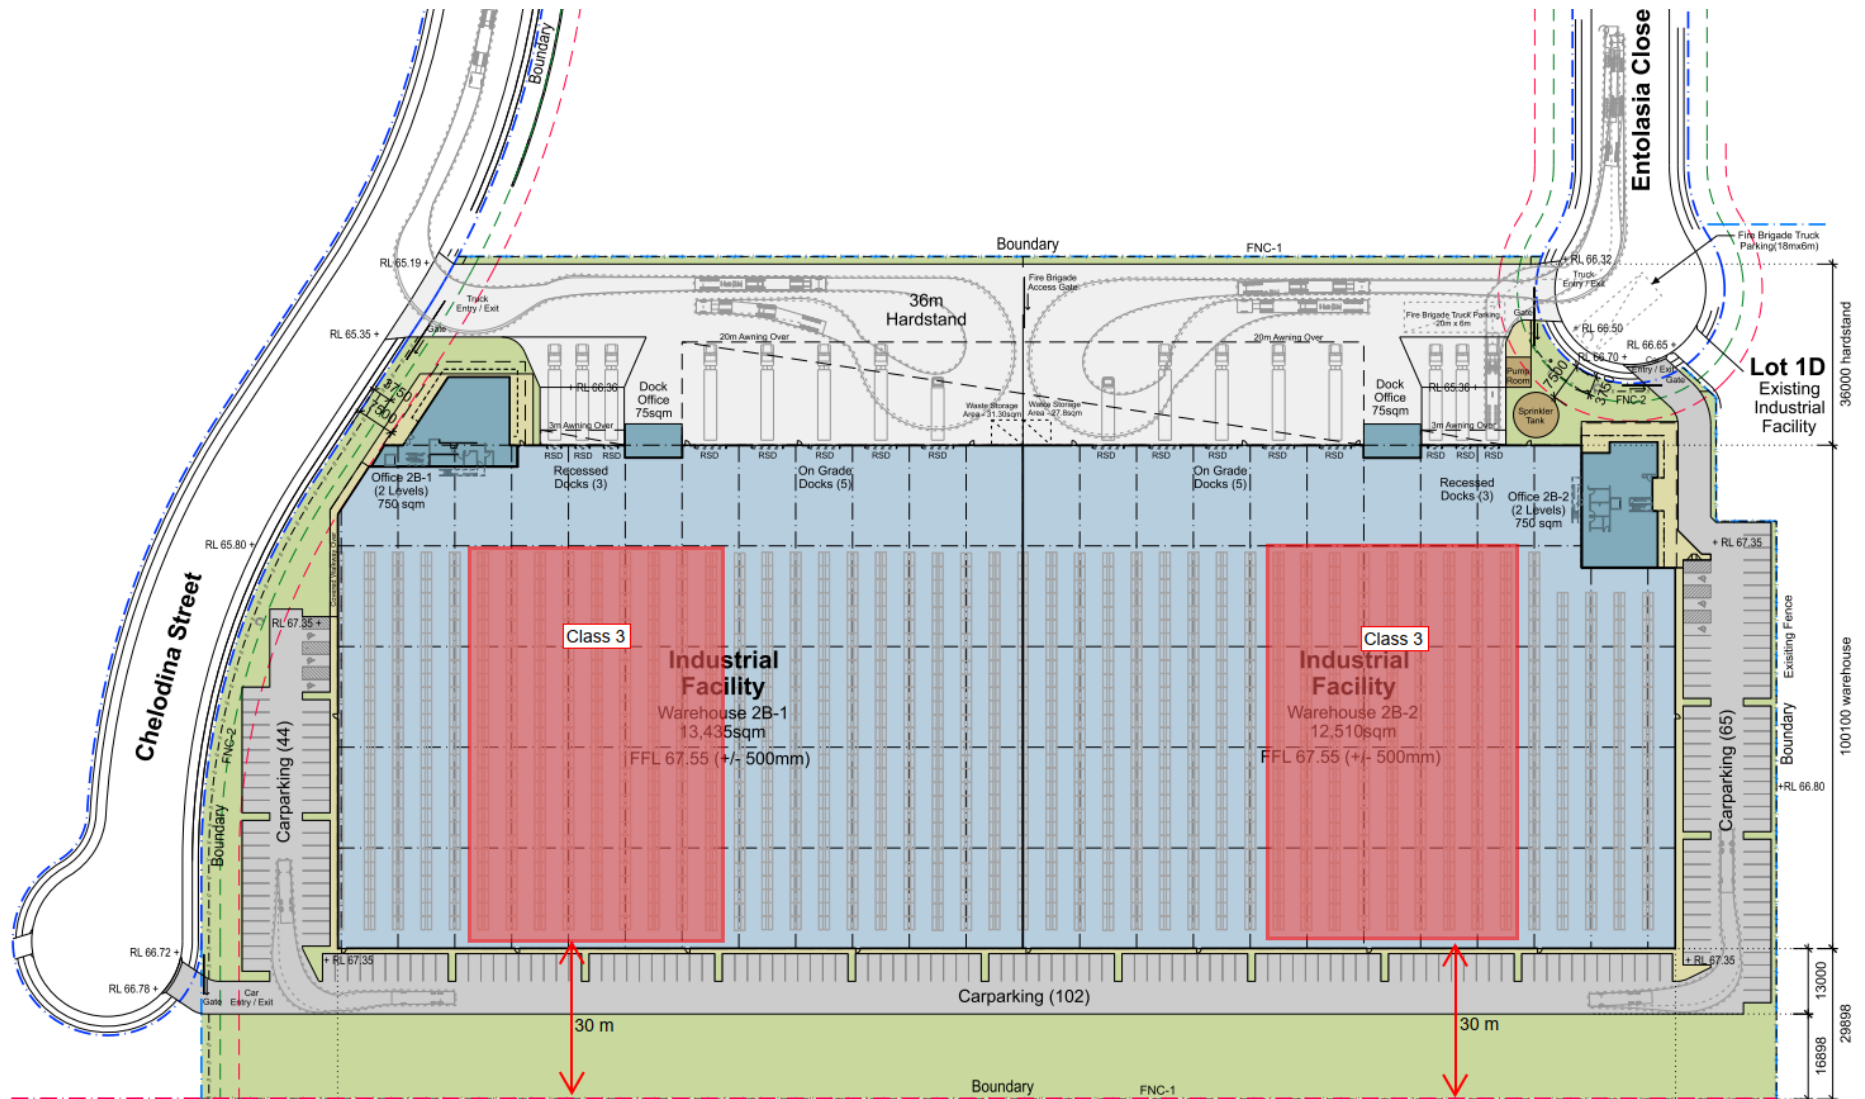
Lot 2B Oakdale South Estate Site Layout
